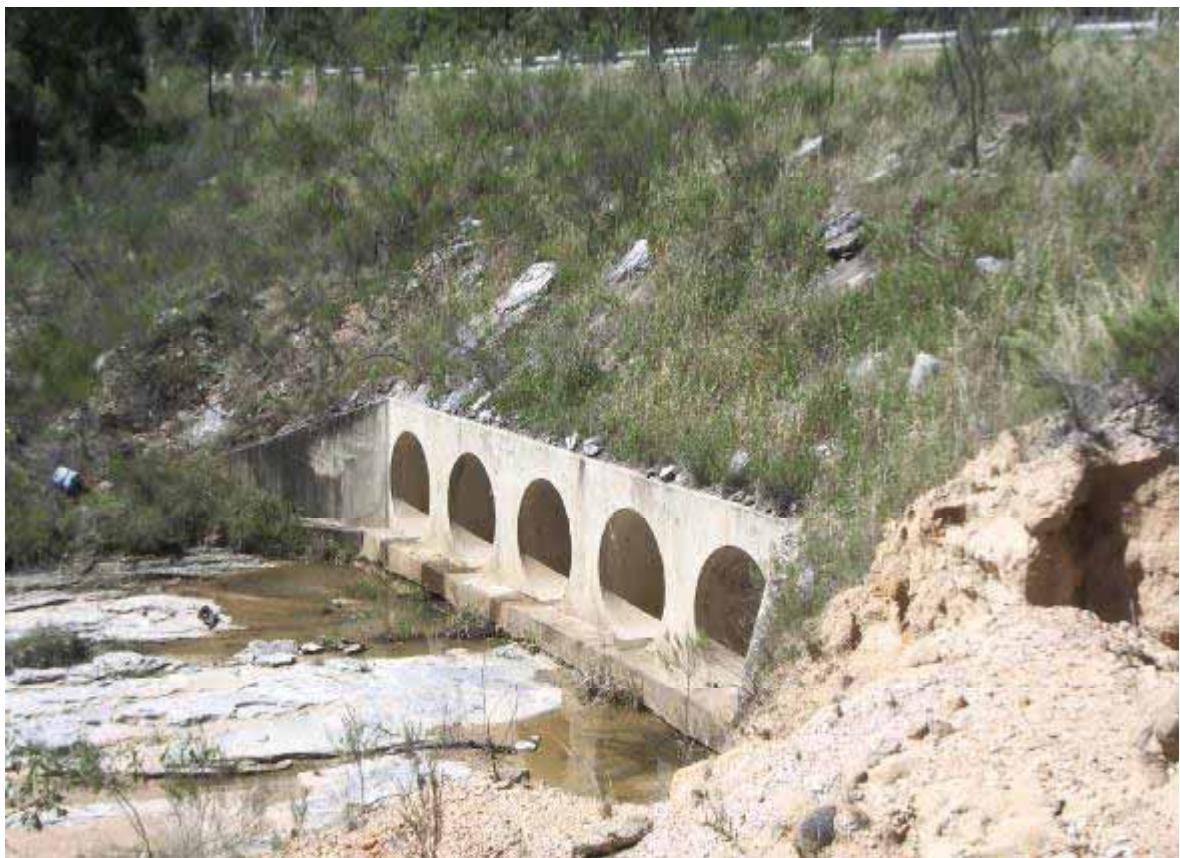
VIEW SHOWING CULVERTS DRAINING RUNOFF FROM BORA CREEK BENEATH THE ULAN – CASSILIS ROAD
